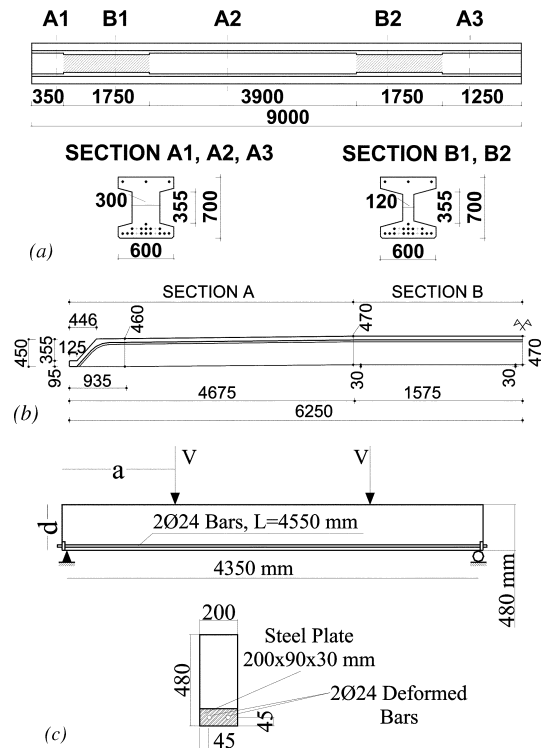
Geometry of: (a) I-Beam specimens; (b) R-Element specimens; and (c) SC-Beam specimens.
